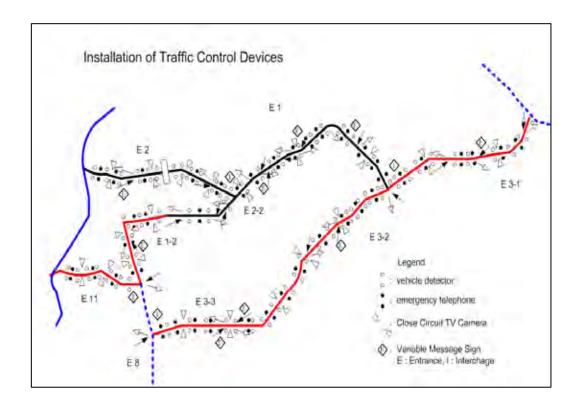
Installation Plan of Traffic Control Devices and Facilities
